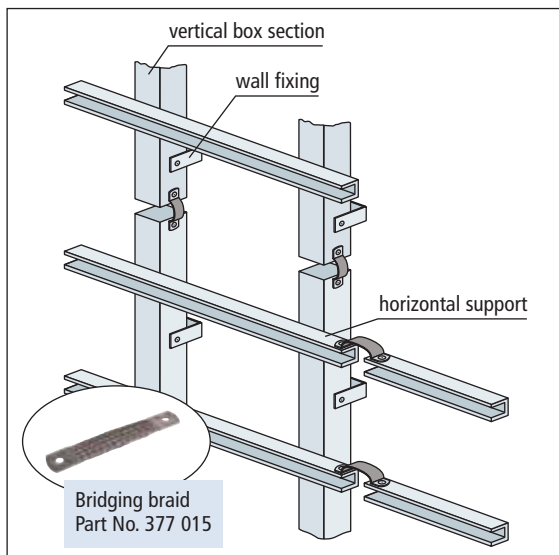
Metal subconstruction, conductively bridged
